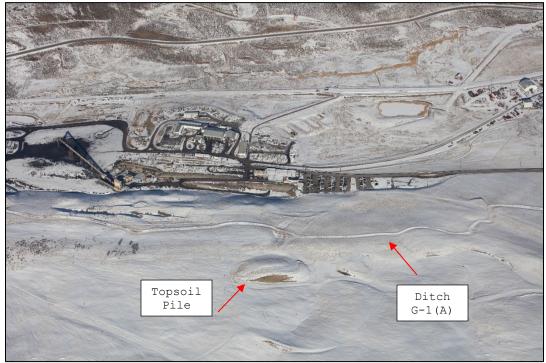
View of the main facilities area which includes a view of a topsoil stockpile to the south and Ditch G-1(A).
